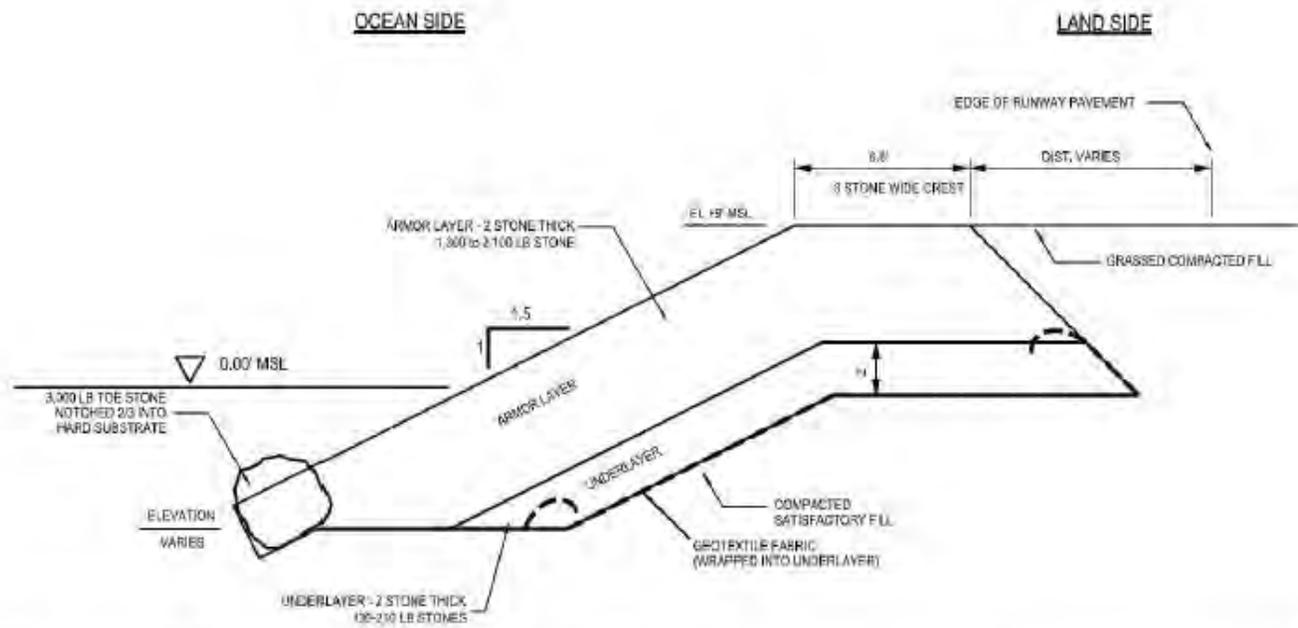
Rock Revetment Alternative. Schematic of the rock revetment alternative design. Schematic provided by Corps.
